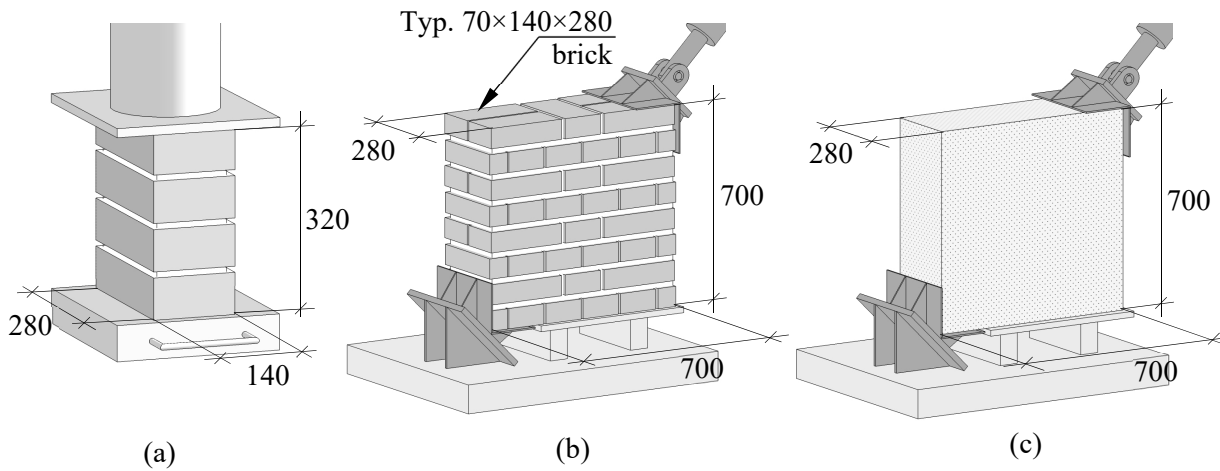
Material characterization assembly tests: a) compression (adobe & RE); b) diagonal tension of adobe; c) diagonal tension of RE.
